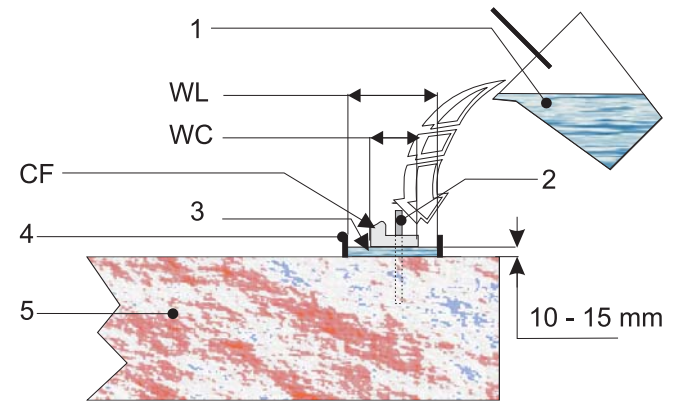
Grouting details of bare compressor on concrete block
